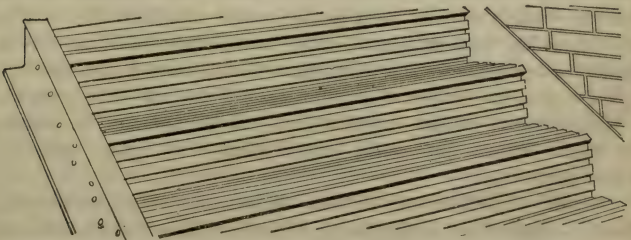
Stairs with Treads and Risers of Ferro-in-clave.
